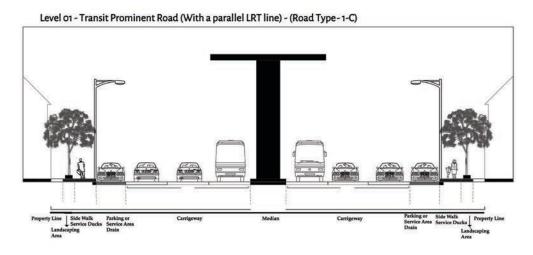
Cross section of a Level 01 – Transit Prominent Road (With a parallel LRT line) - (Road Type - 1–C)
